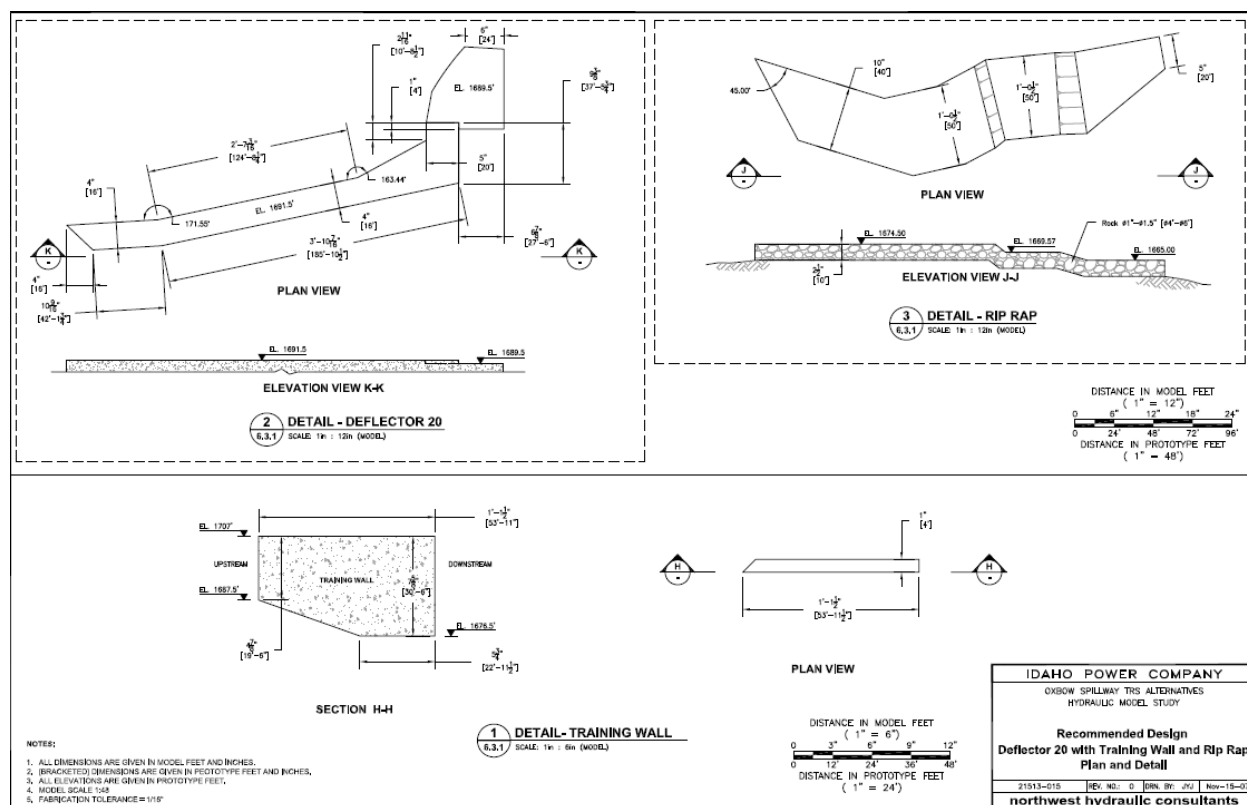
Plan and sectional view showing the general location of the Oxbow Dam spillway flow deflector and a detailed sectional view drawing of the proposed design (reproduced from Exhibit 7.3-6)
